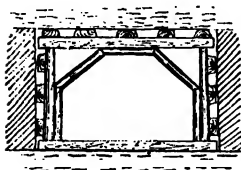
Method of Timbering where Roof, Sides, and Floor require strong Timber
